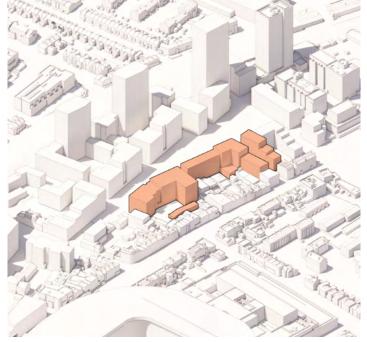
Proposed illustrative massing highlighting the parkside design approach buildings
